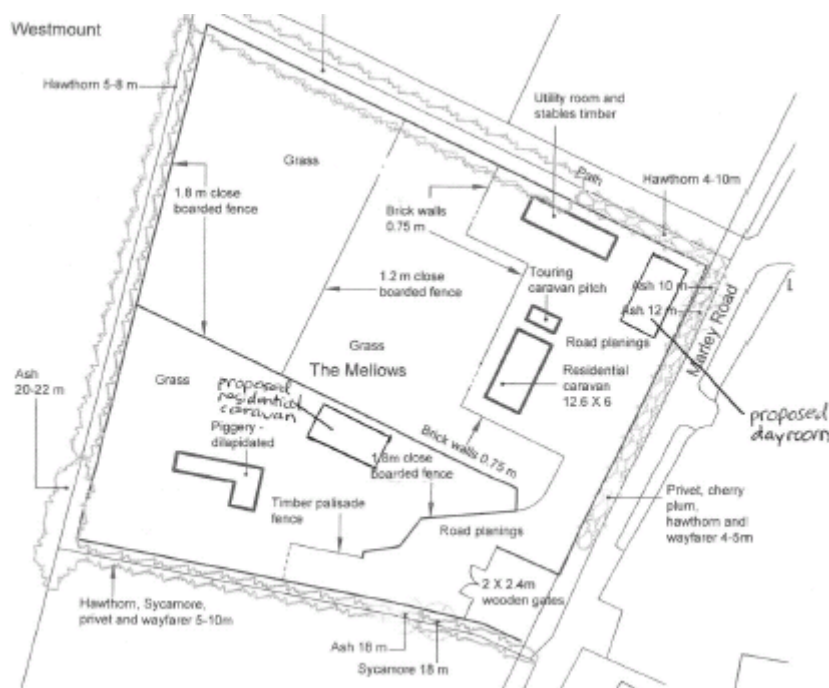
Proposed Site Layout Plan of ref. 14/504218/FULL Additional mobile home and day room and demolition of former piggeries. (approved)
